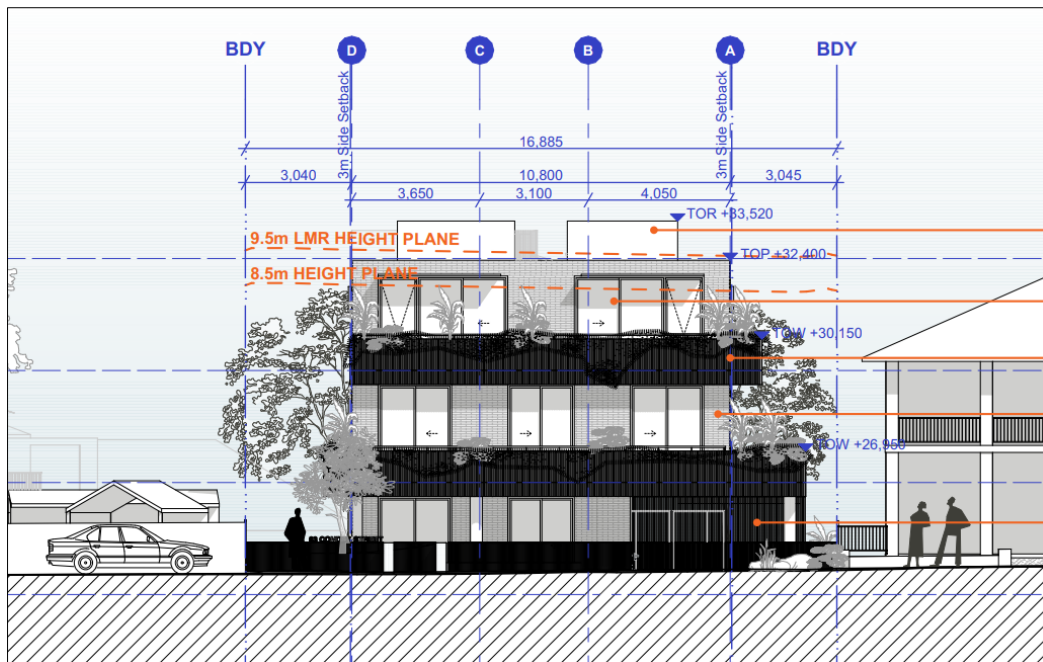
(above) Front Elevation plan submitted by the applicant. Source: Benson McCormack (2026).
